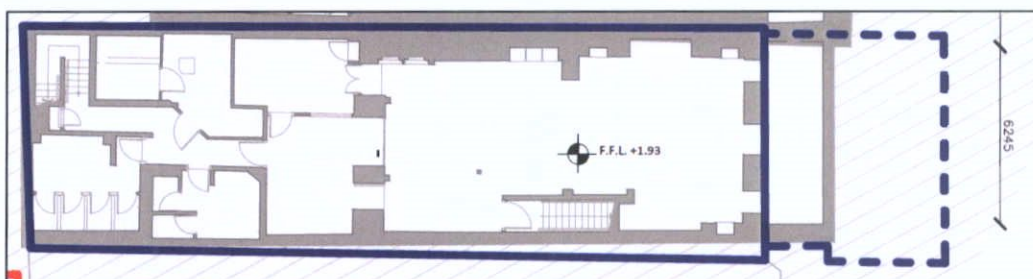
Existing basement within No. 61 O'Connell Street Upper
